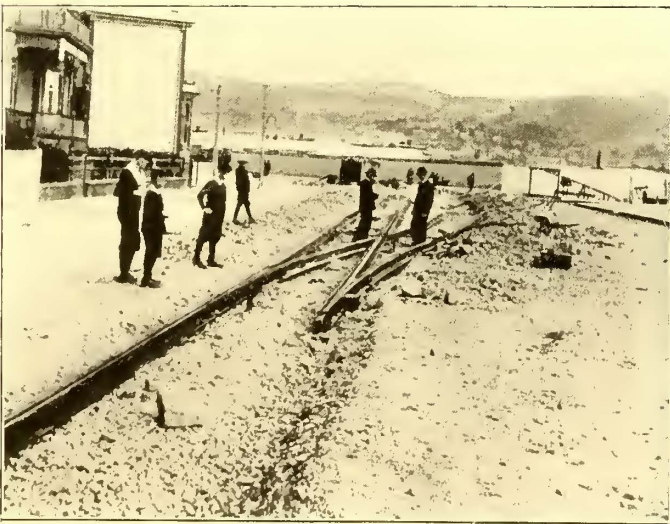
TRACK CONSTRUCTION AT ORIENTAL BAY
